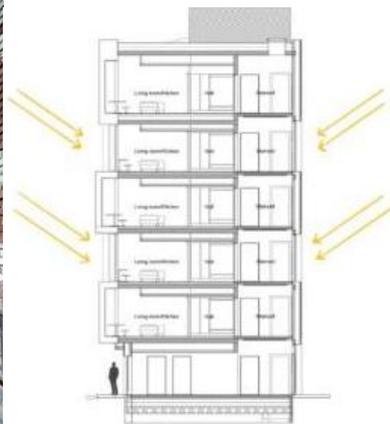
Roof top deck Figure 17: Section showing alternating windows and screens
